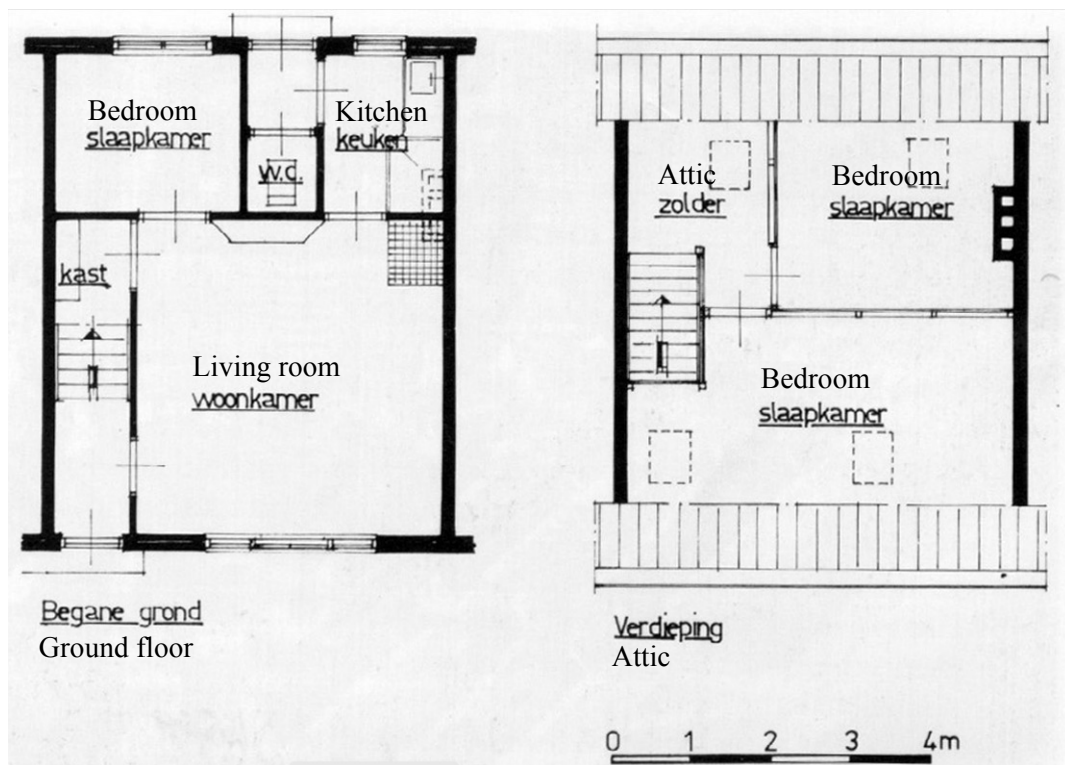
Emergency Housing, Oud-Mathenesse, Rotterdam, 1922-23 plan layout
